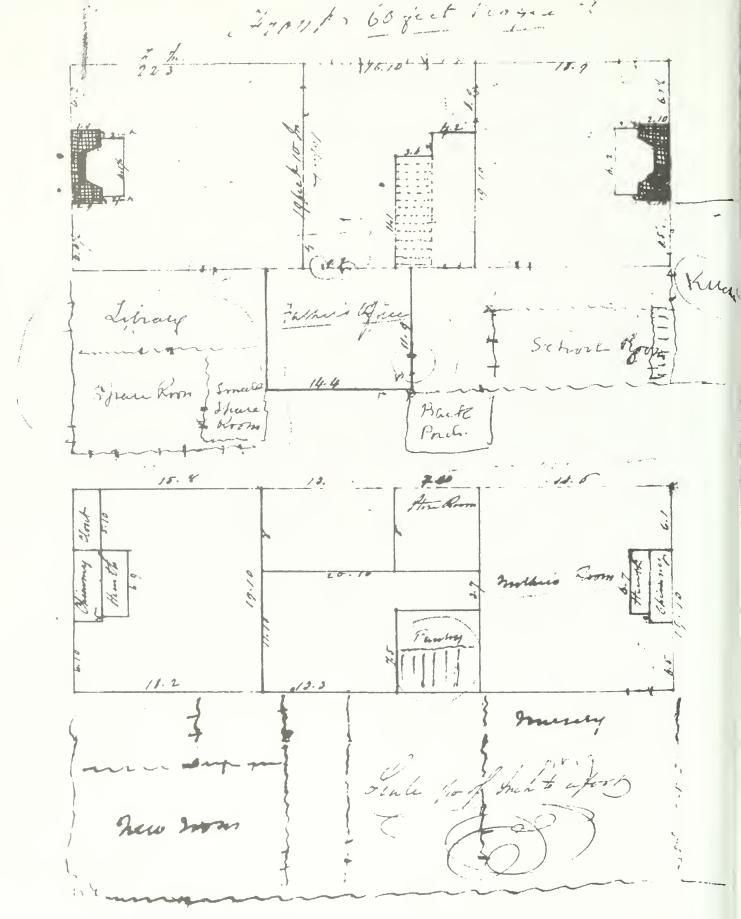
Early floor plan of the Schuyler House (circa 1787 with later annotations).
